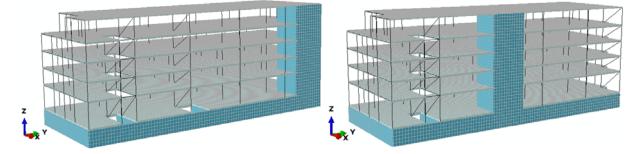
Building I and II, a conventional building system in Norway; left, building I and right, building II.
